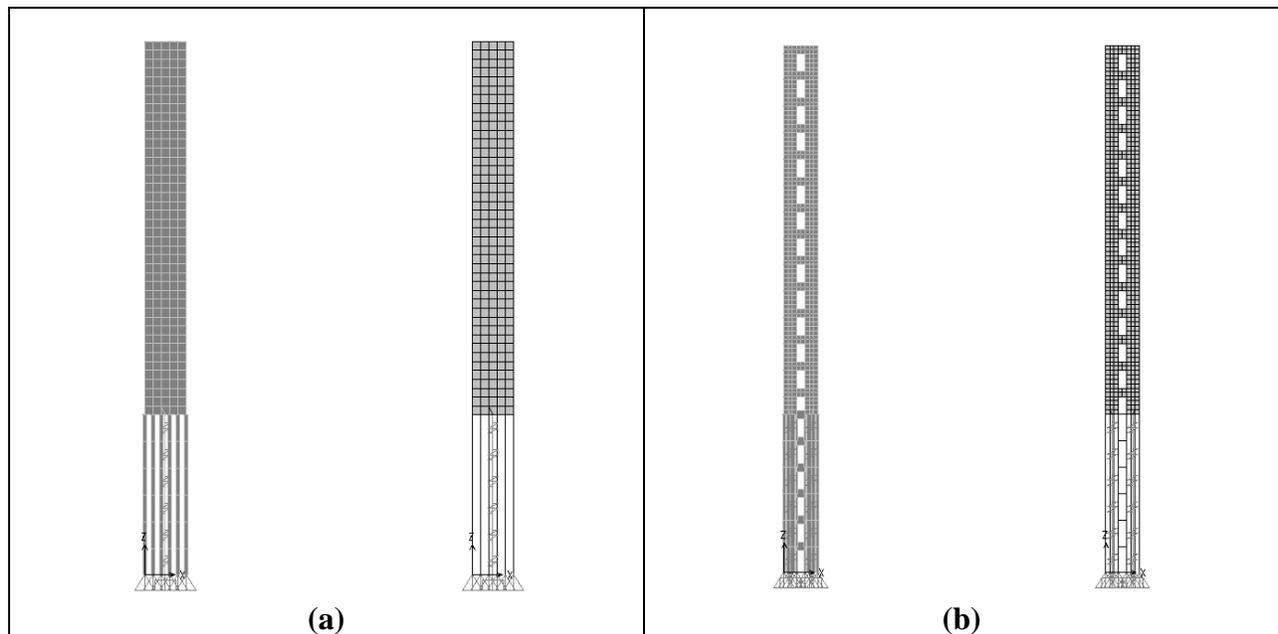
(a) Fiber or frame model of plain wall; (b) Fiber or frame model of core wall with opening
